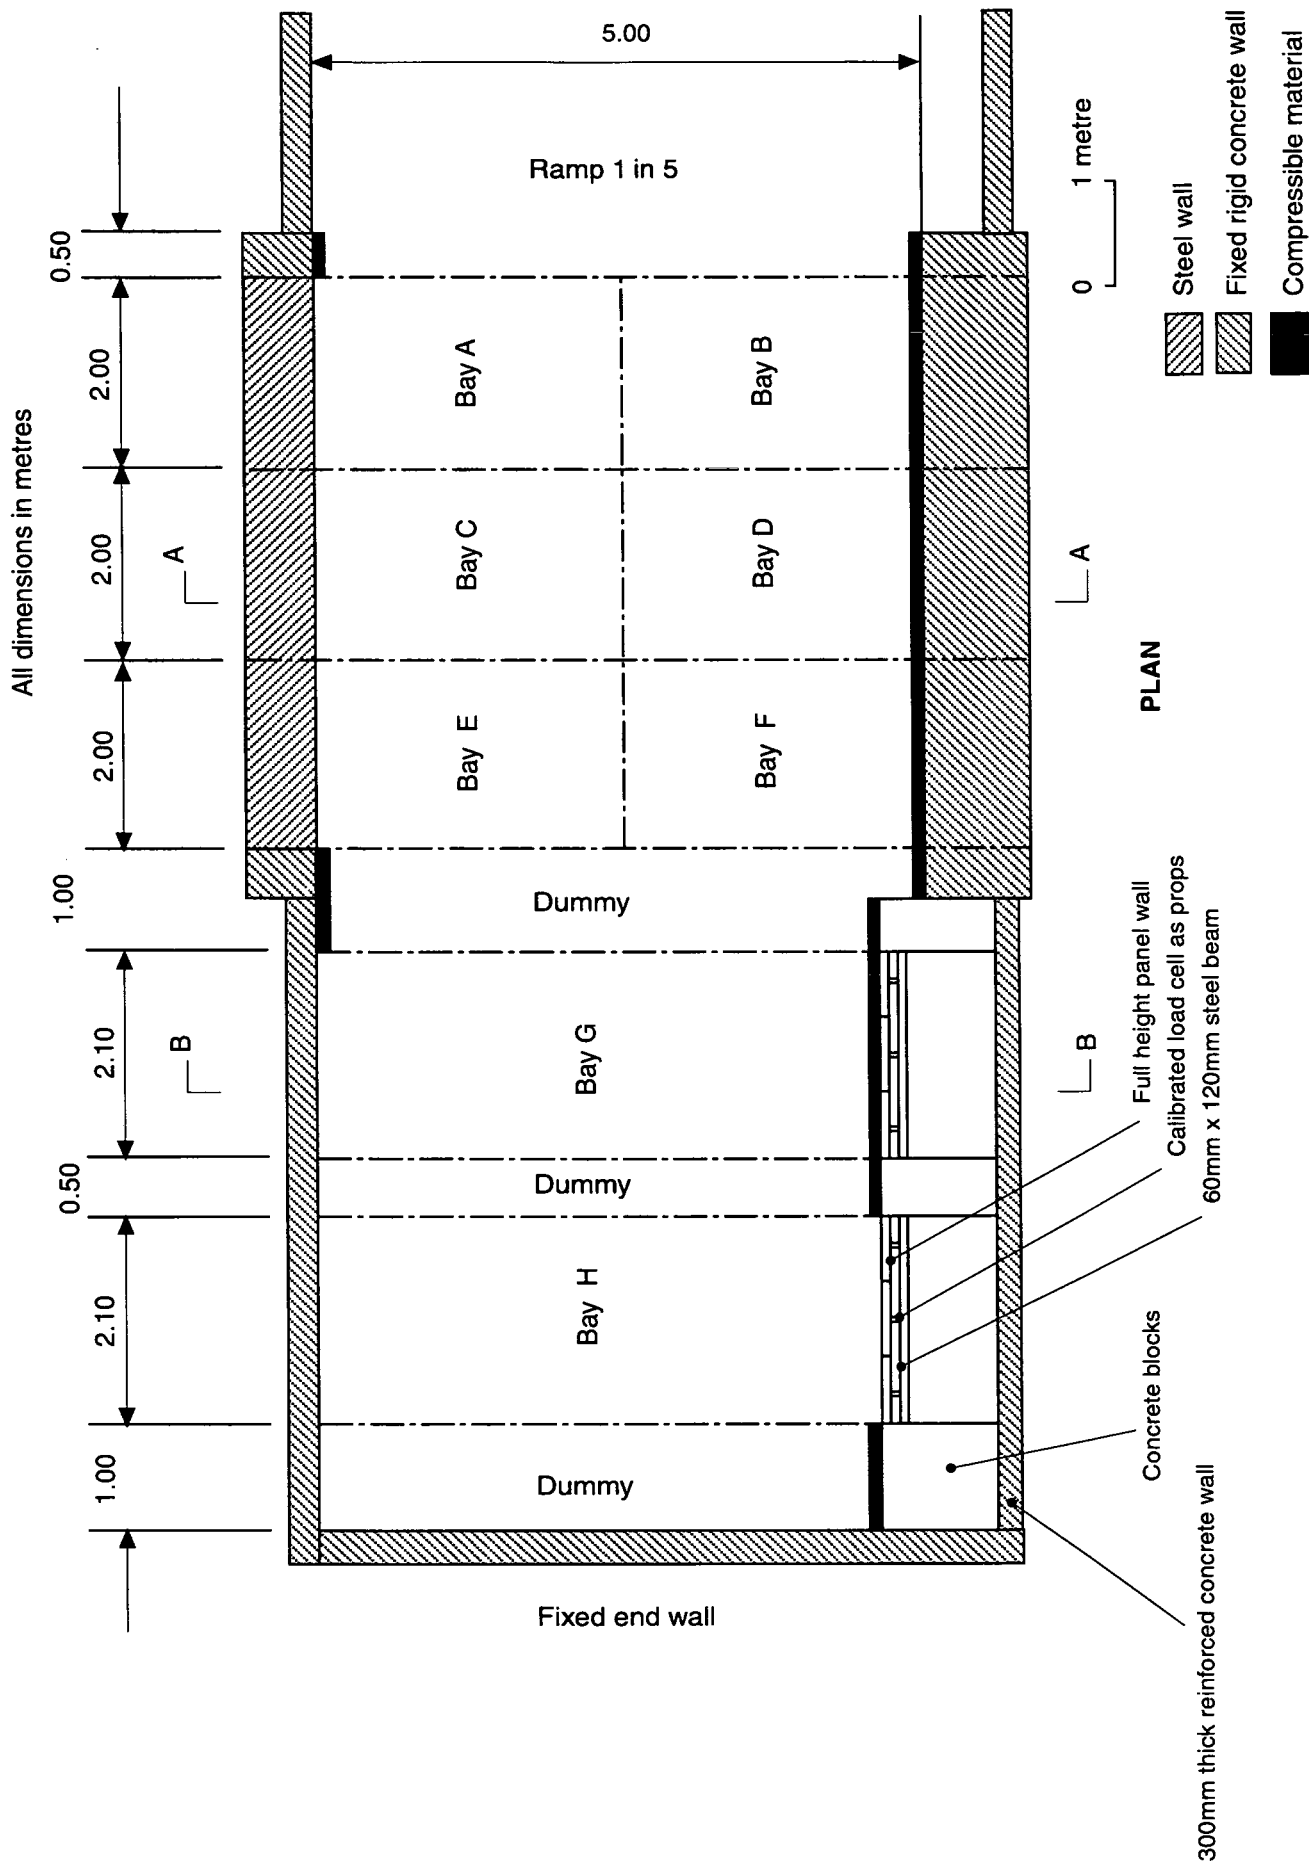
Plan view of retaining wall facility showing bay arrangement (after Loke, 1991)
